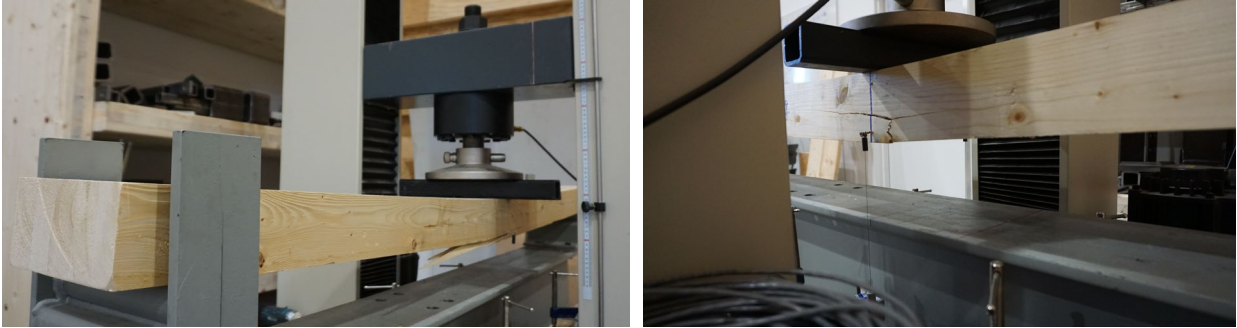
Typical failure modes of timber beams under bending
